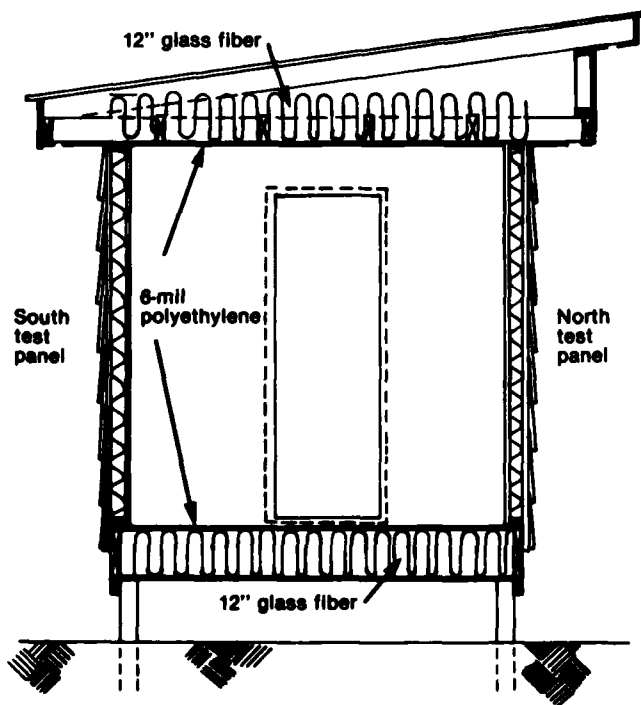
Cross section of experimental structure showing construction details. (ML83 5061)
